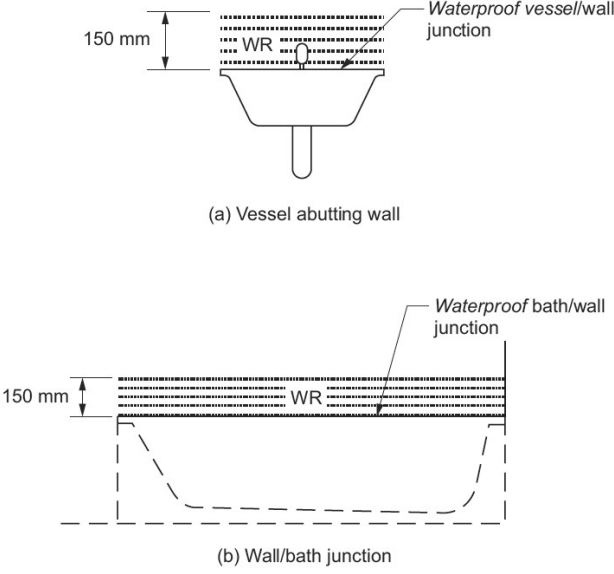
Areas adjacent to baths and spas without showers for concrete, compressed fibre-cement and fibre-cement sheet flooring
